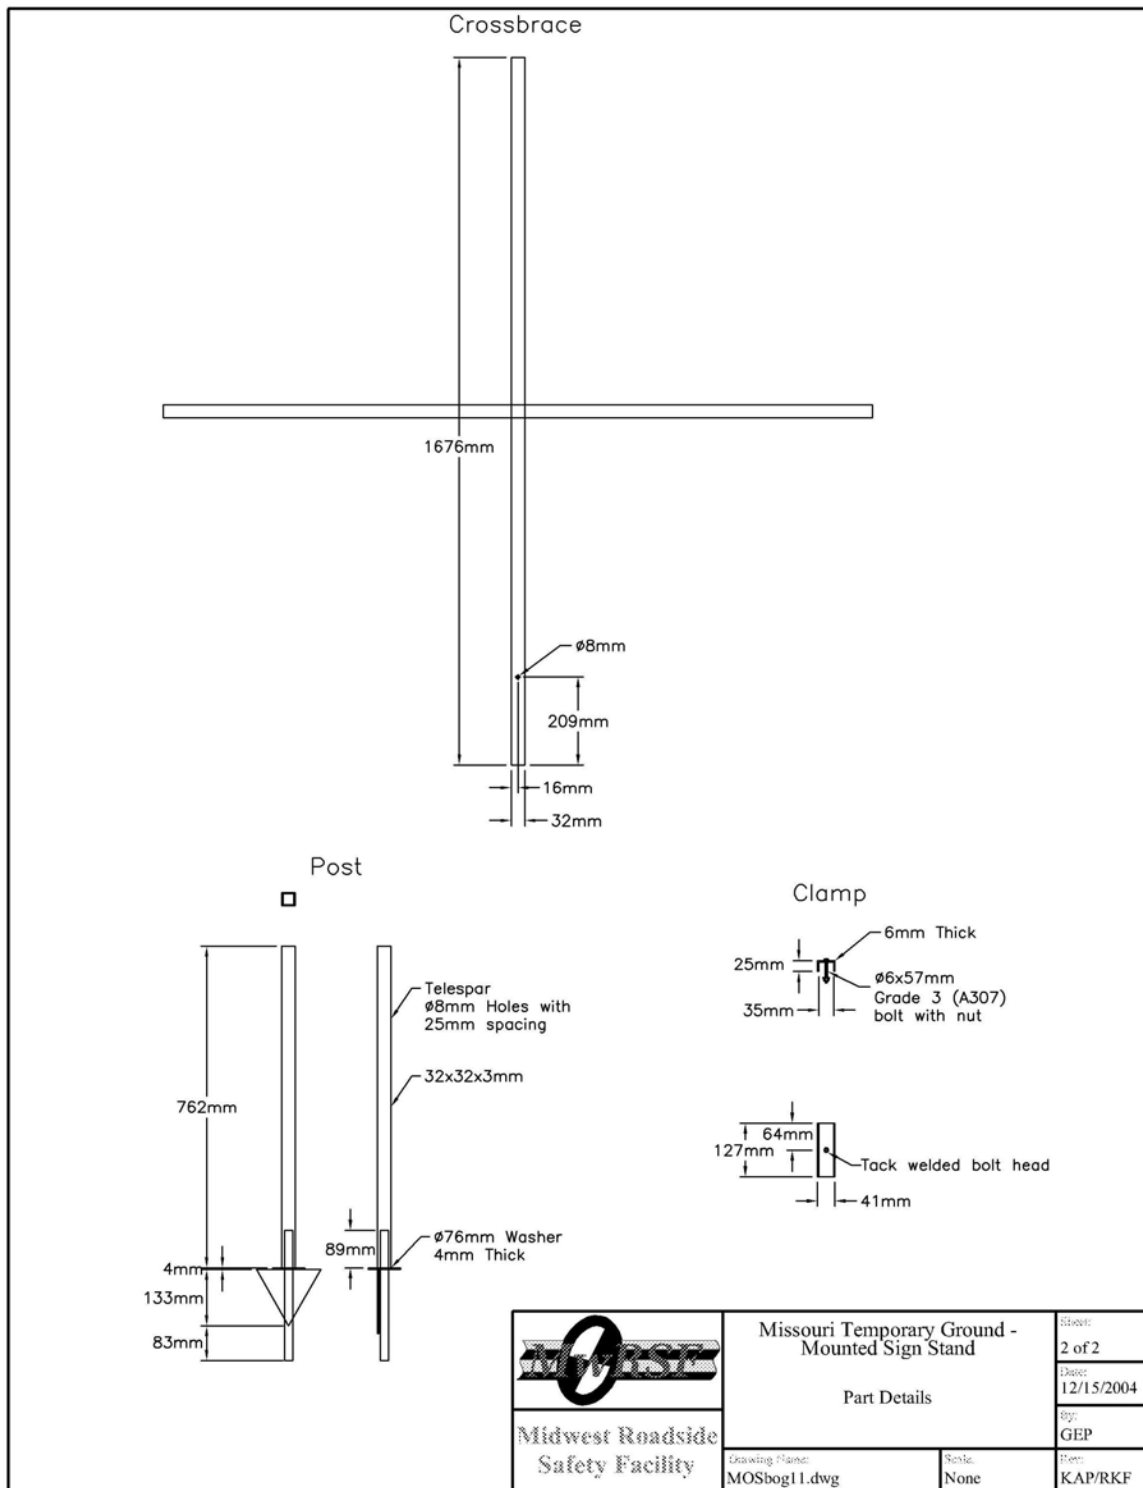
Ground-Mounted, Single-Post Sign System Design Details, Bogie Test MOSBOG-11
